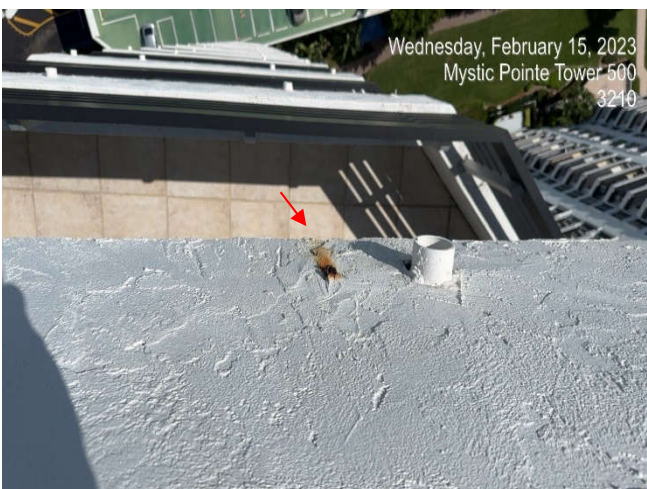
b.3 – Rust spot at the balcony knee wall (Unit 3210)
